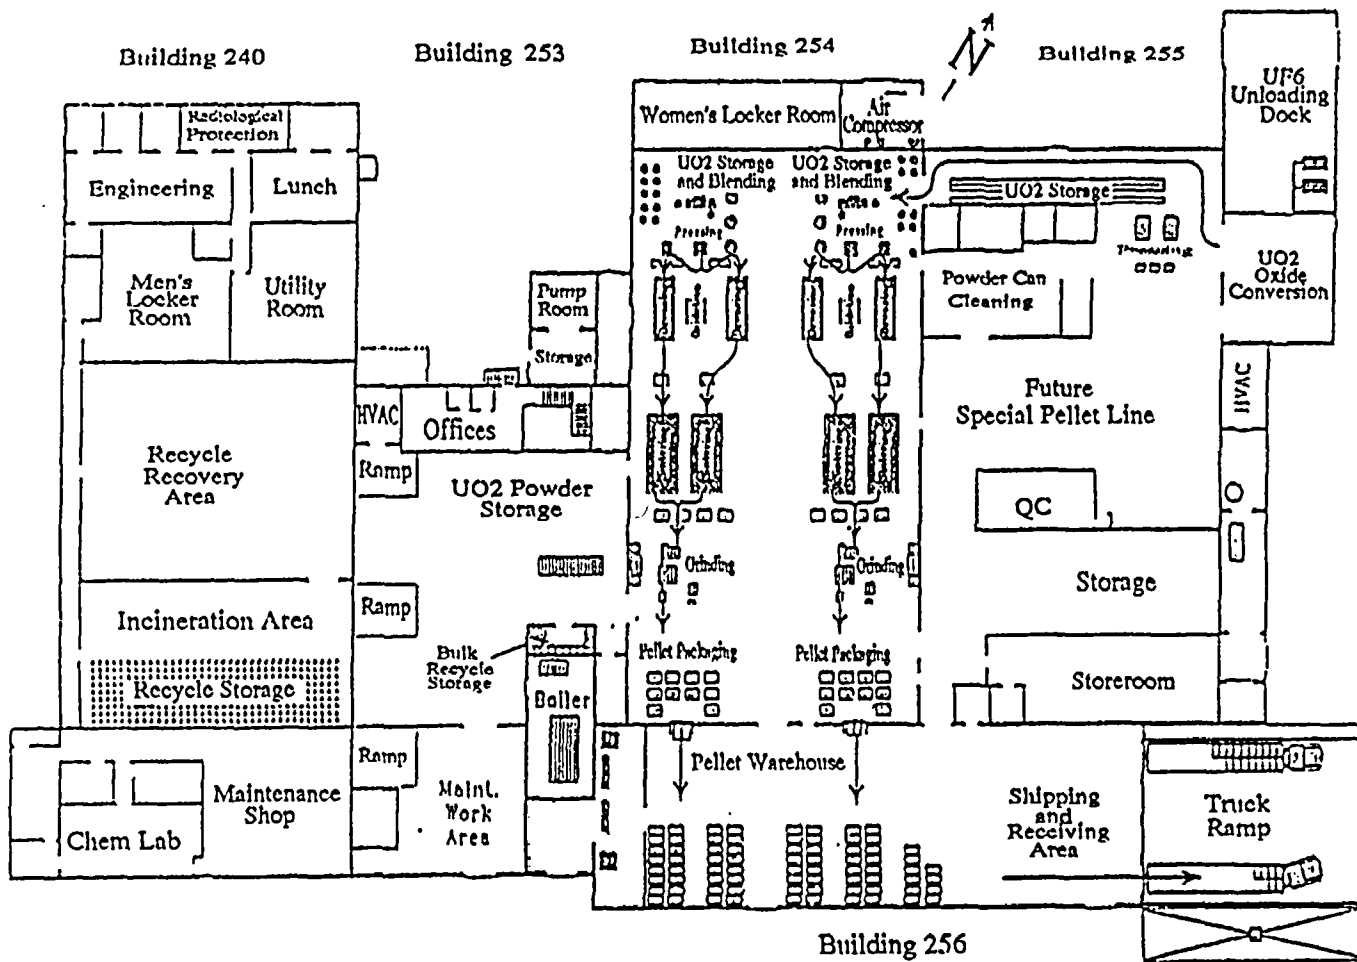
HEMATITE BUILDING AND EQUIPMENT LAYOUT
